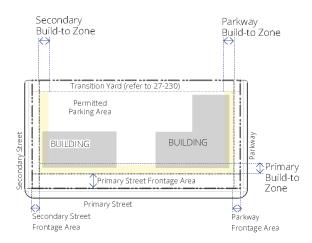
Corner and Build-to Zones on Different Street Types
